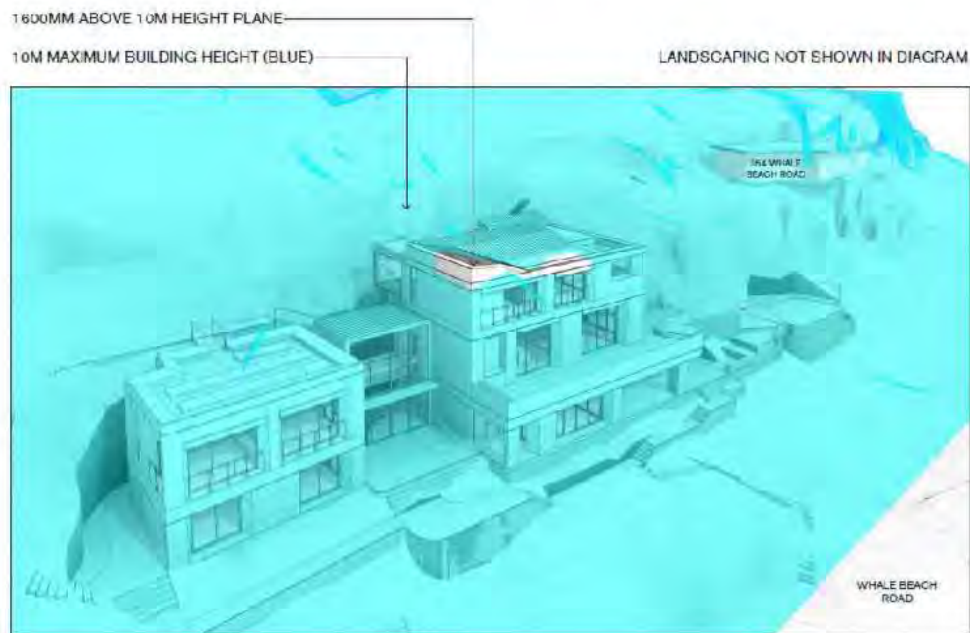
Extract of Section 4 showing departure from the 10m building height plane (in blue) at the Master Bedroom (Source: Tzannes)
